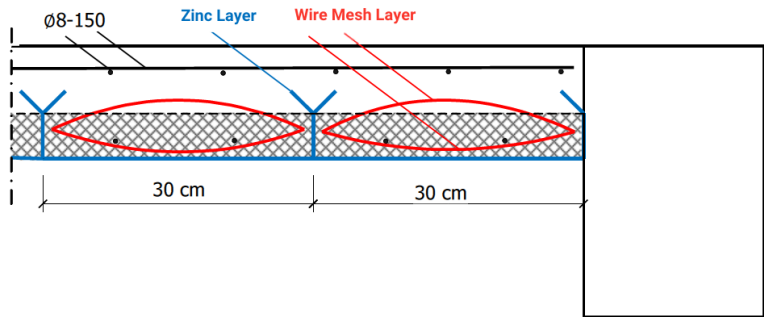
Zinc-coated ferrocement plate formwork detail B.
